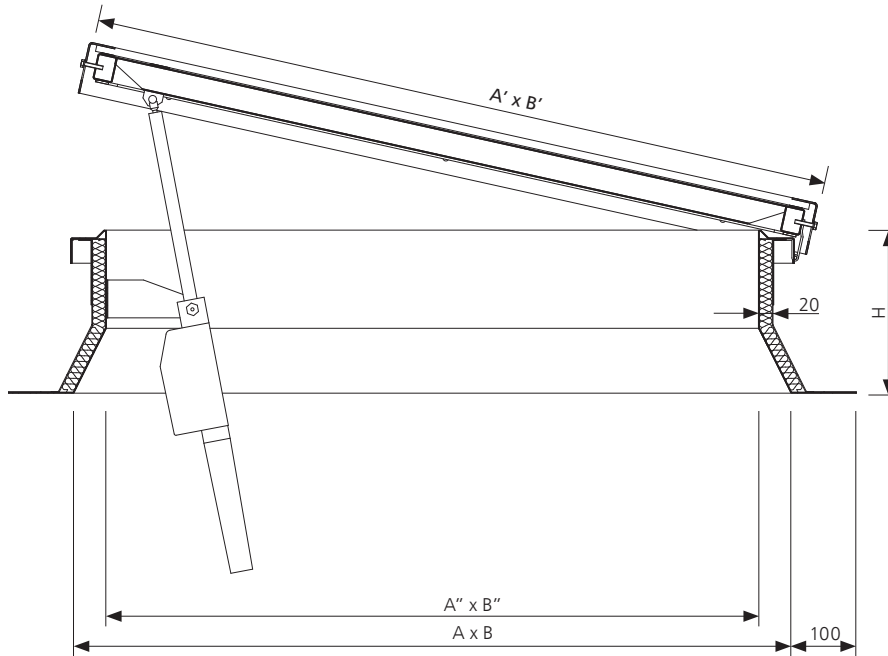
Section B-B of mcr PROLIGHT NG-A ventilation vent with skew base in open position, dimensions in [mm]
